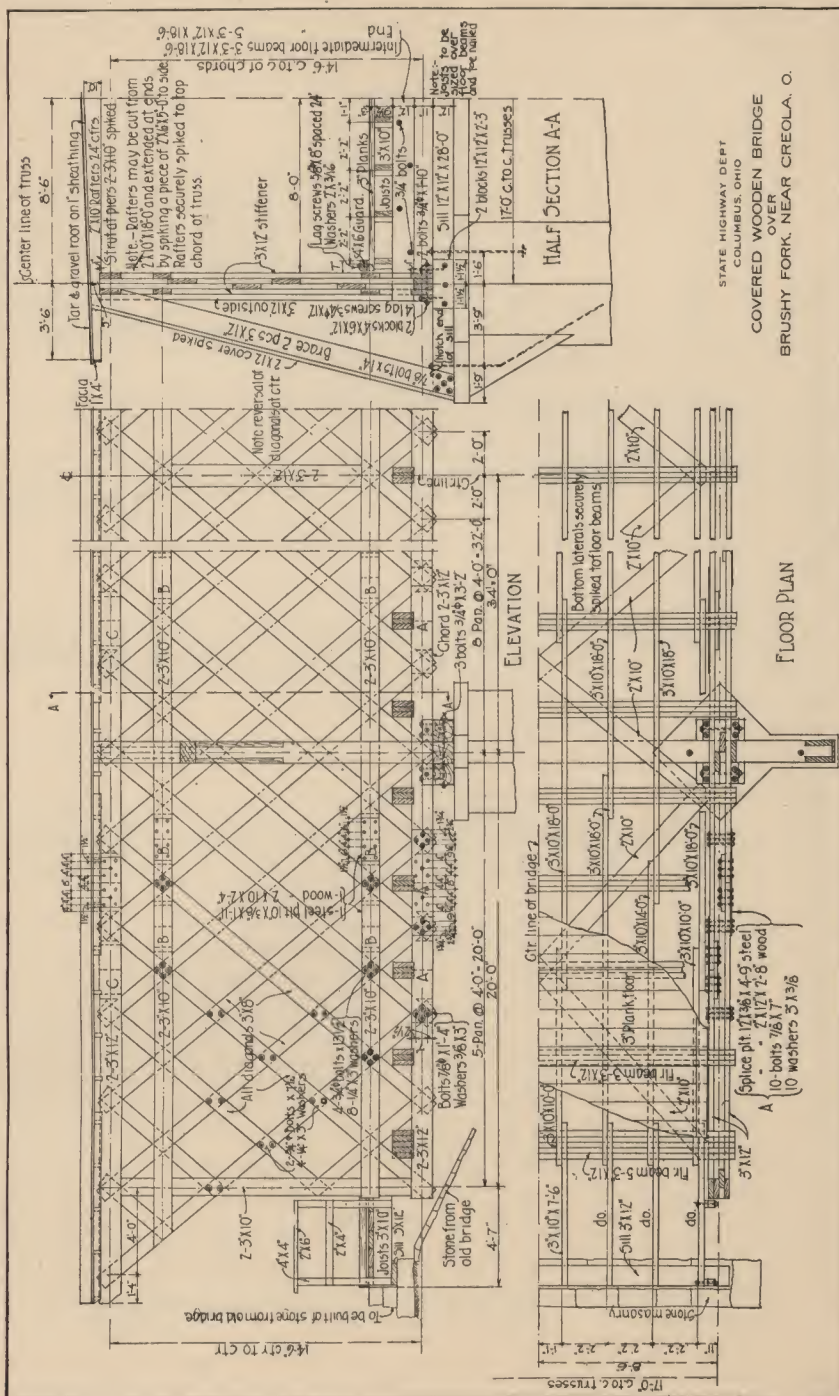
Detail of Lattice Timber Bridge Shown in Fig. 7.
